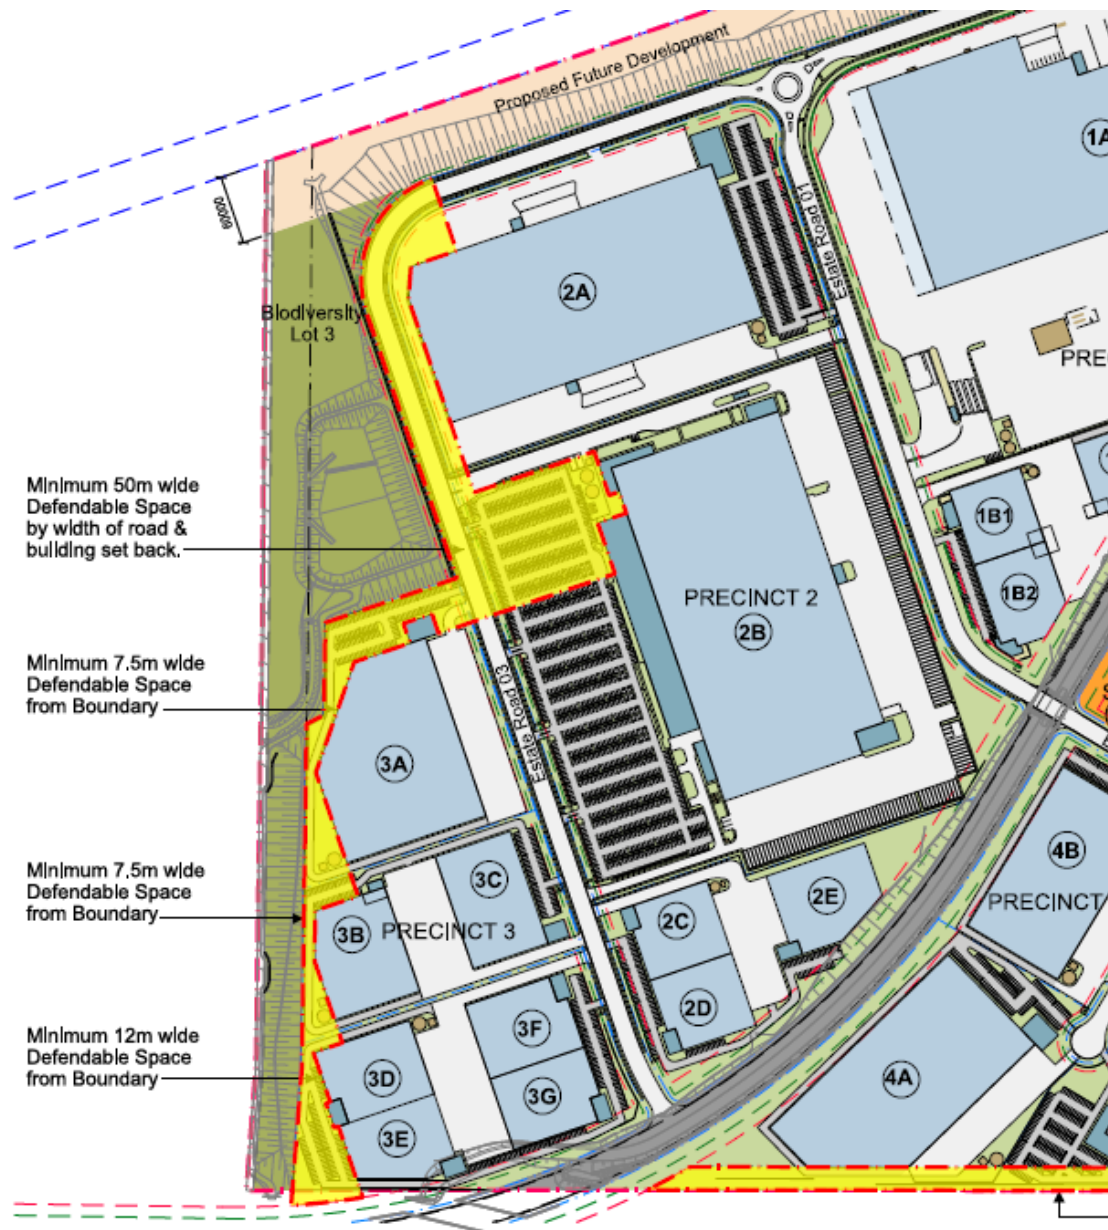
on Page 13 is the Site Plan for the proposed Warehouse Building on site 2B within the Stage 2 Precinct.
